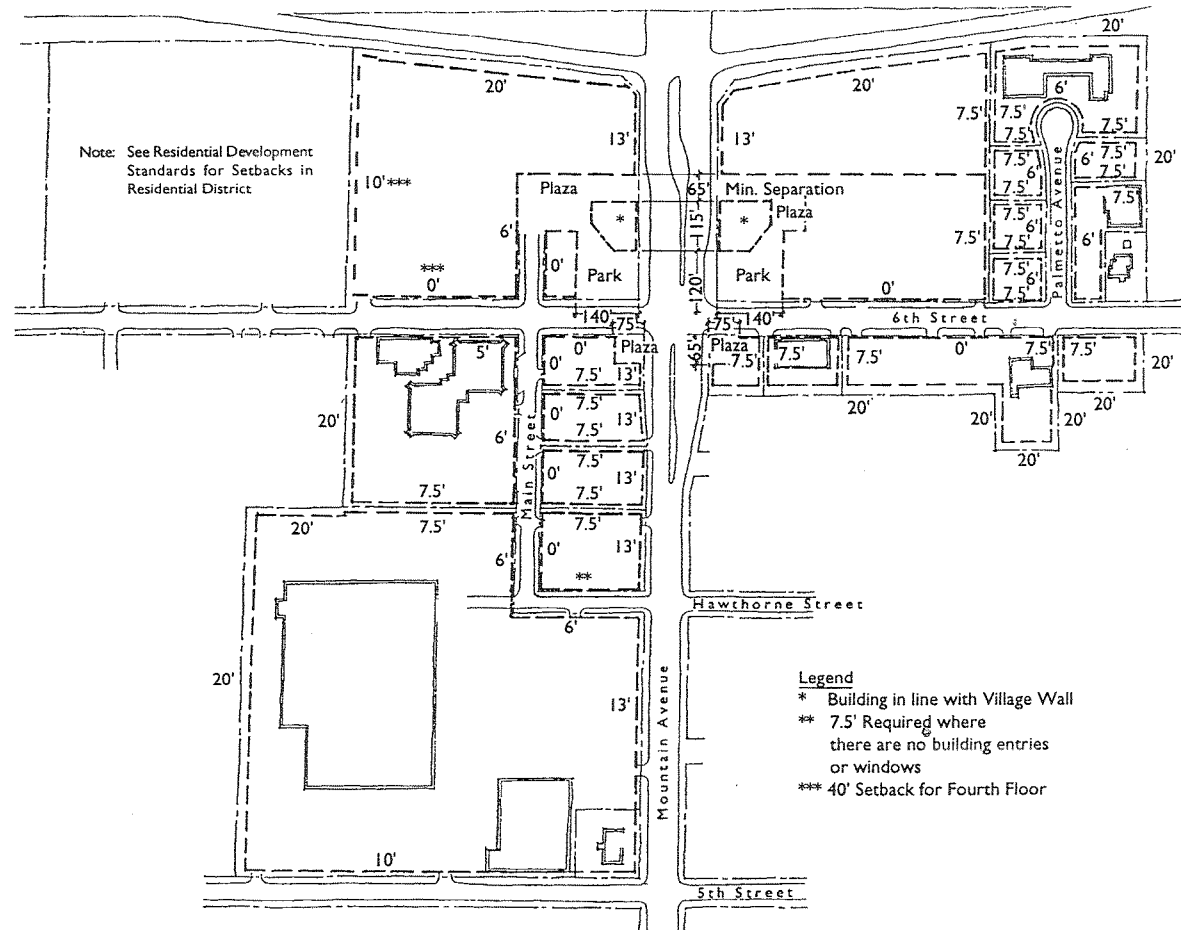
, Commercial Building Setbacks. This diagram graphically depicts the minimum building setbacks called for in Table 3. (Setback requirements for the Village Wall are separate and appear on pages 40 and 41.)
